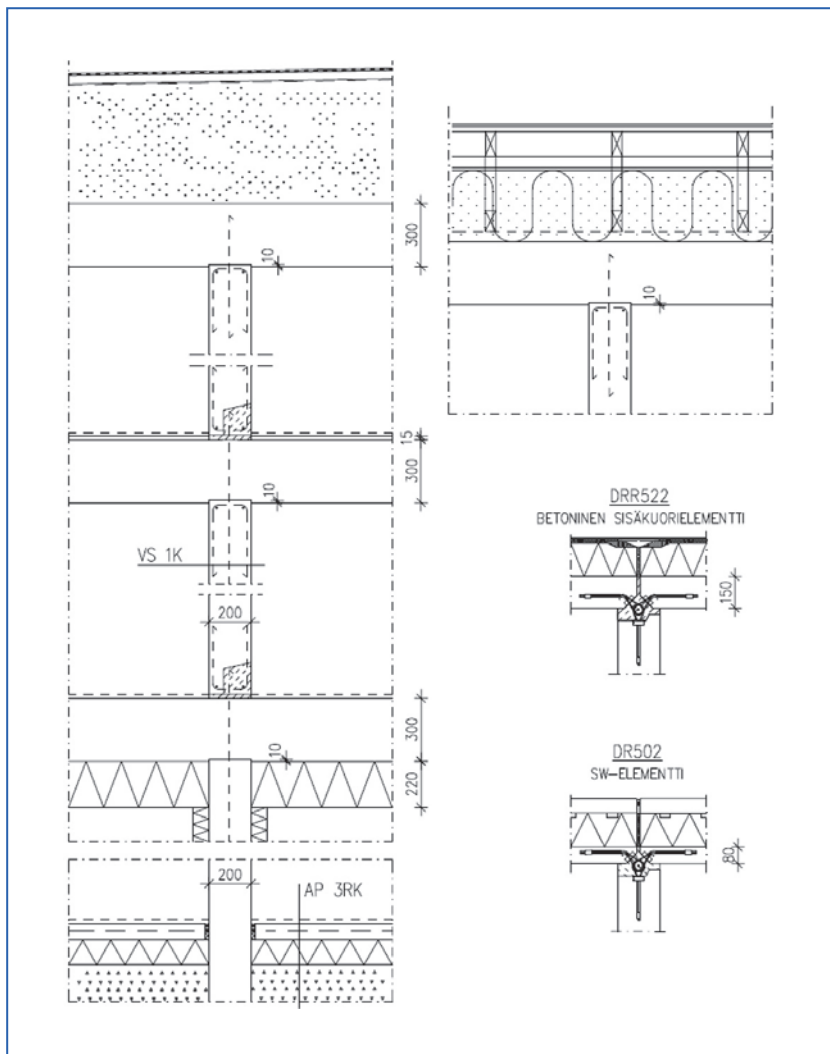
Structural system in apartments / flats with massive concrete slab as the floor structure [1].
